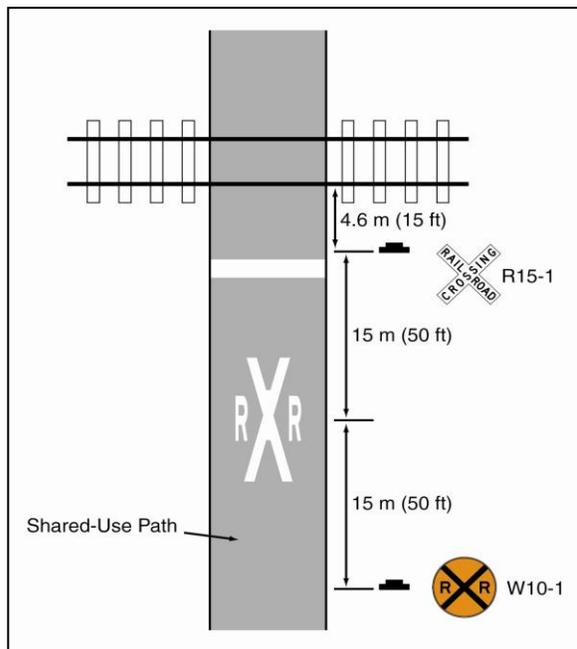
Advanced warning signs and pavement markings should be provided prior to a railroad crossing. (MUTCD)
